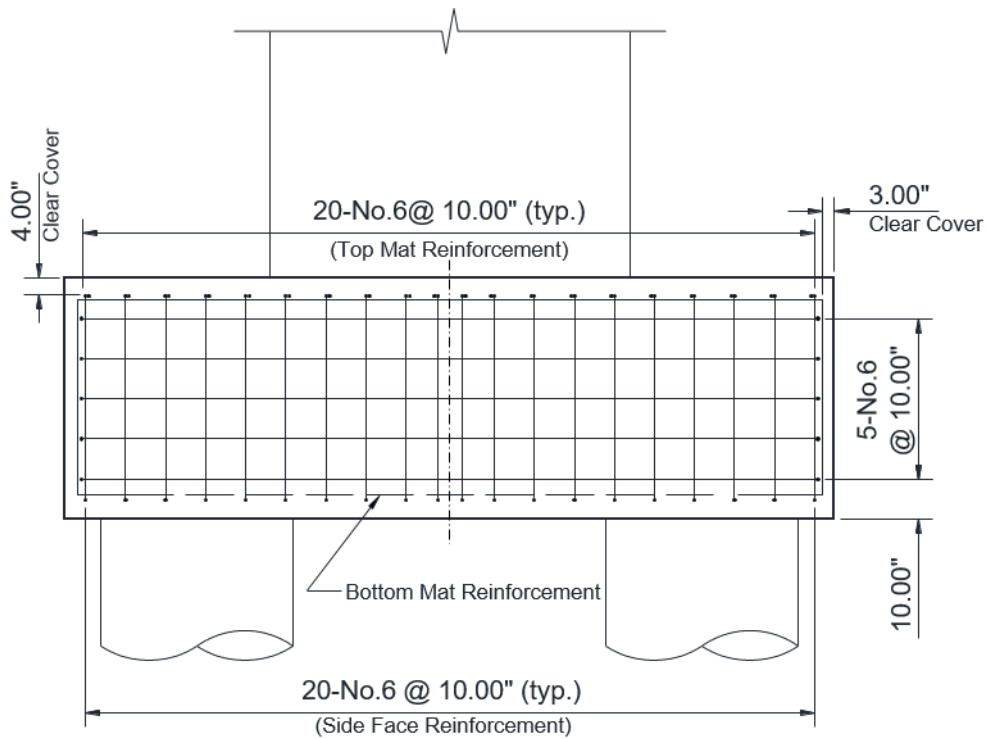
Reinforcement details for shrinkage and temperature reinforcement: elevation view
